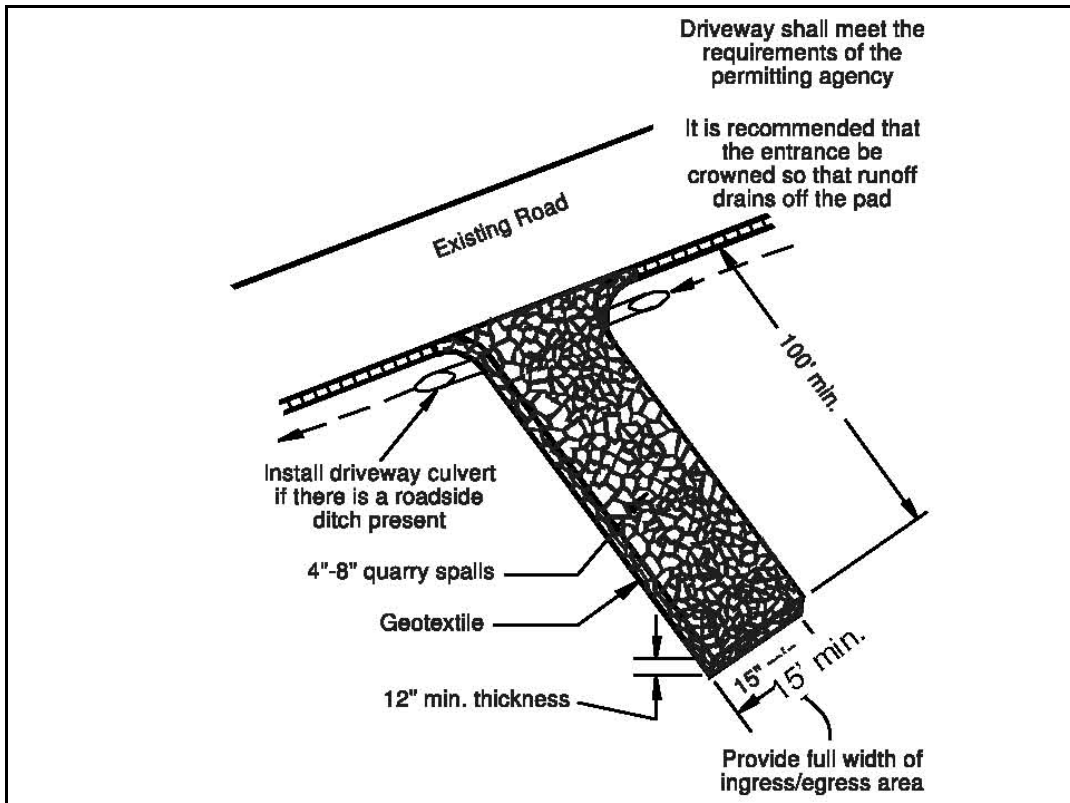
STABILIZED CONSTRUCTION ENTRANCE
